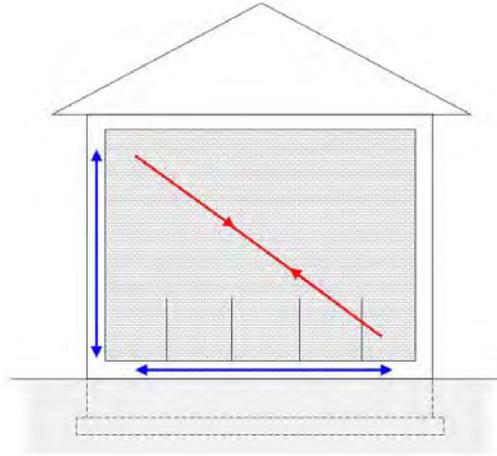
Tension in confining elements (blue) resulting from compression strut in masonry wall (red)
